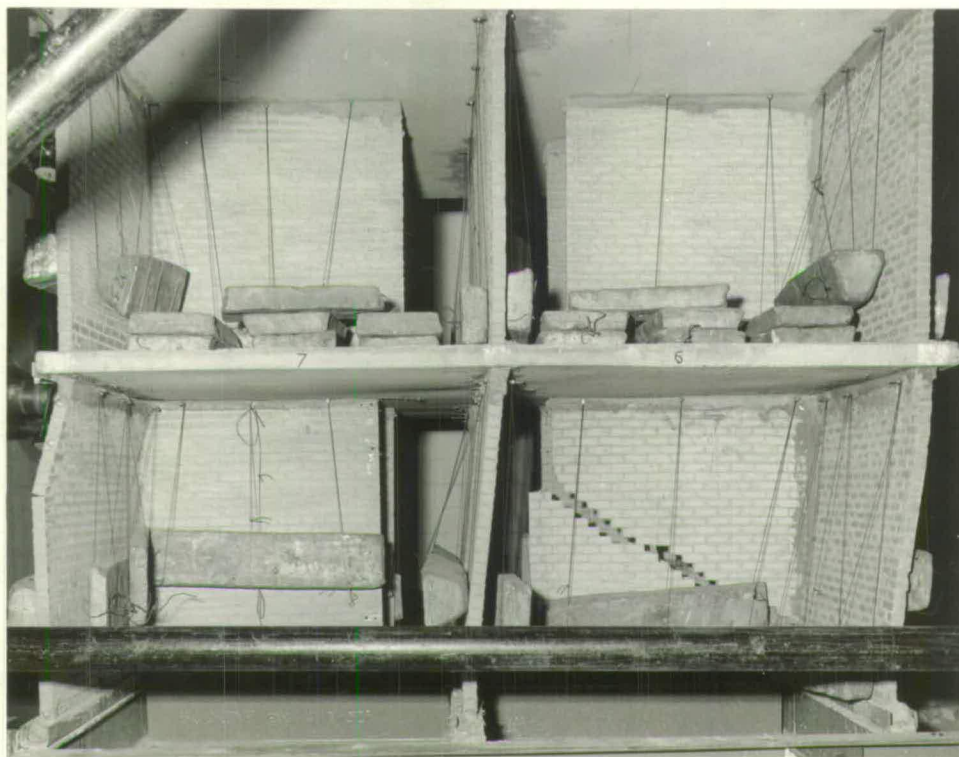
Showing the failure of shear walls (another two) in first storey.
